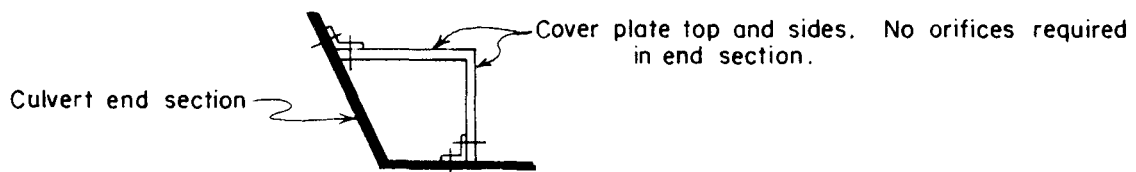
Proposed Orifice Fishway for Culverts or Pipe Arch
